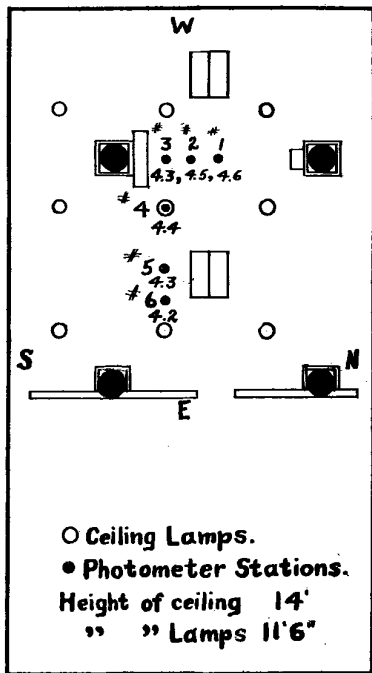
Section plan of third floor, (ladies' reception room), location of furniture, pillars, lighting units, test stations and illumination data.
